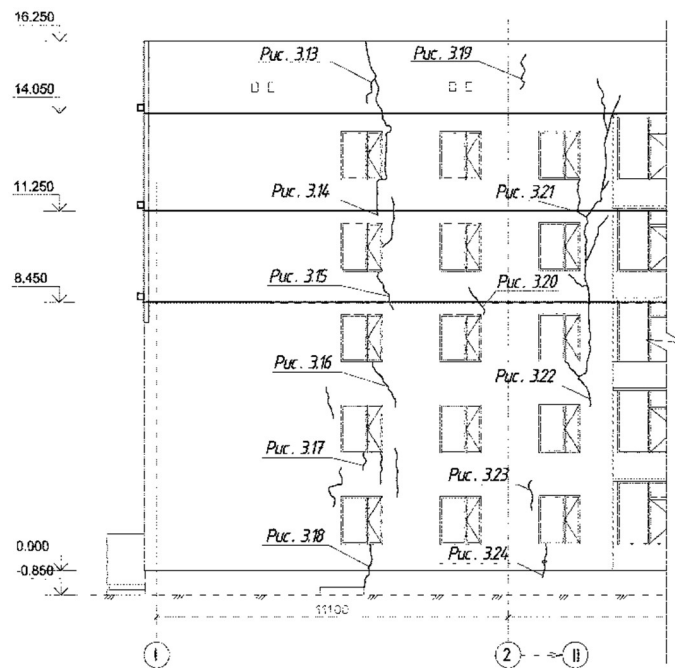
Scheme of defects and damages in the brickwork of the outer walls on the I-2, face, along A axis (left end block section I-II) by the geotechnical monitoring data
